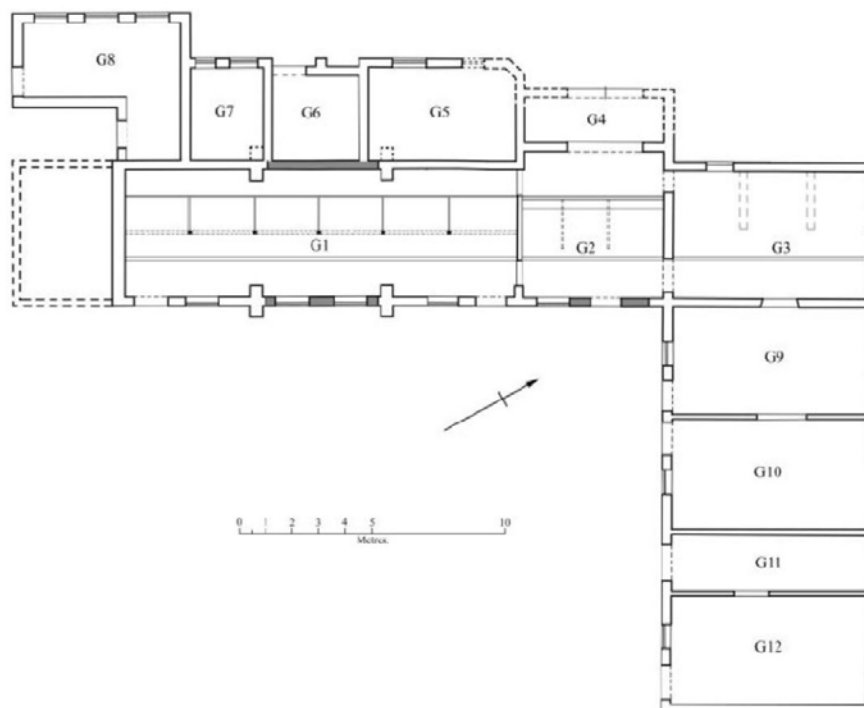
Block B ground floor plan (after Hradil and Nevell 2009, 97). Scale: as shown.
